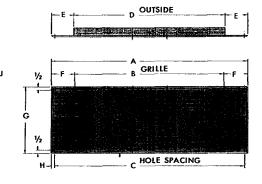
Type P (6-9) Hinged Return Air Grille with Cam Lock
